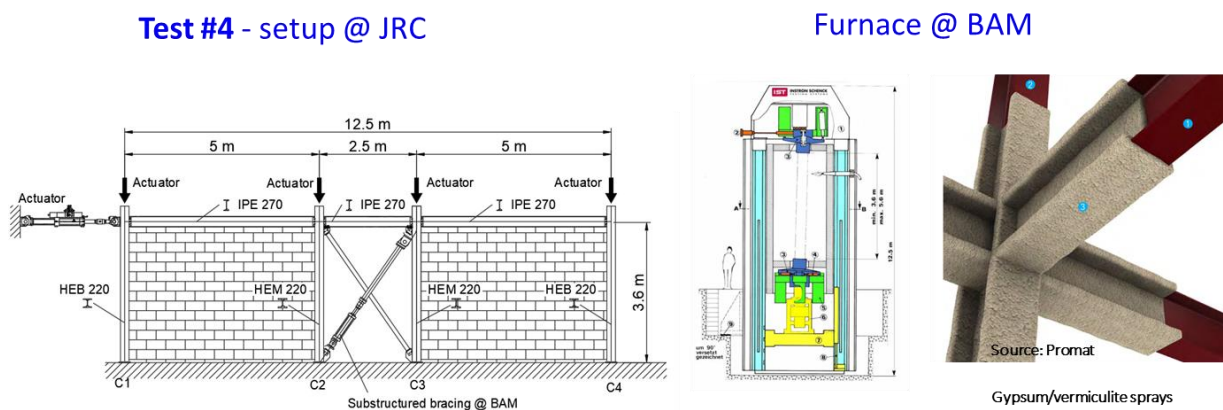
TEST #4: test on post-earthquake fire effects on a protected bracing element.
